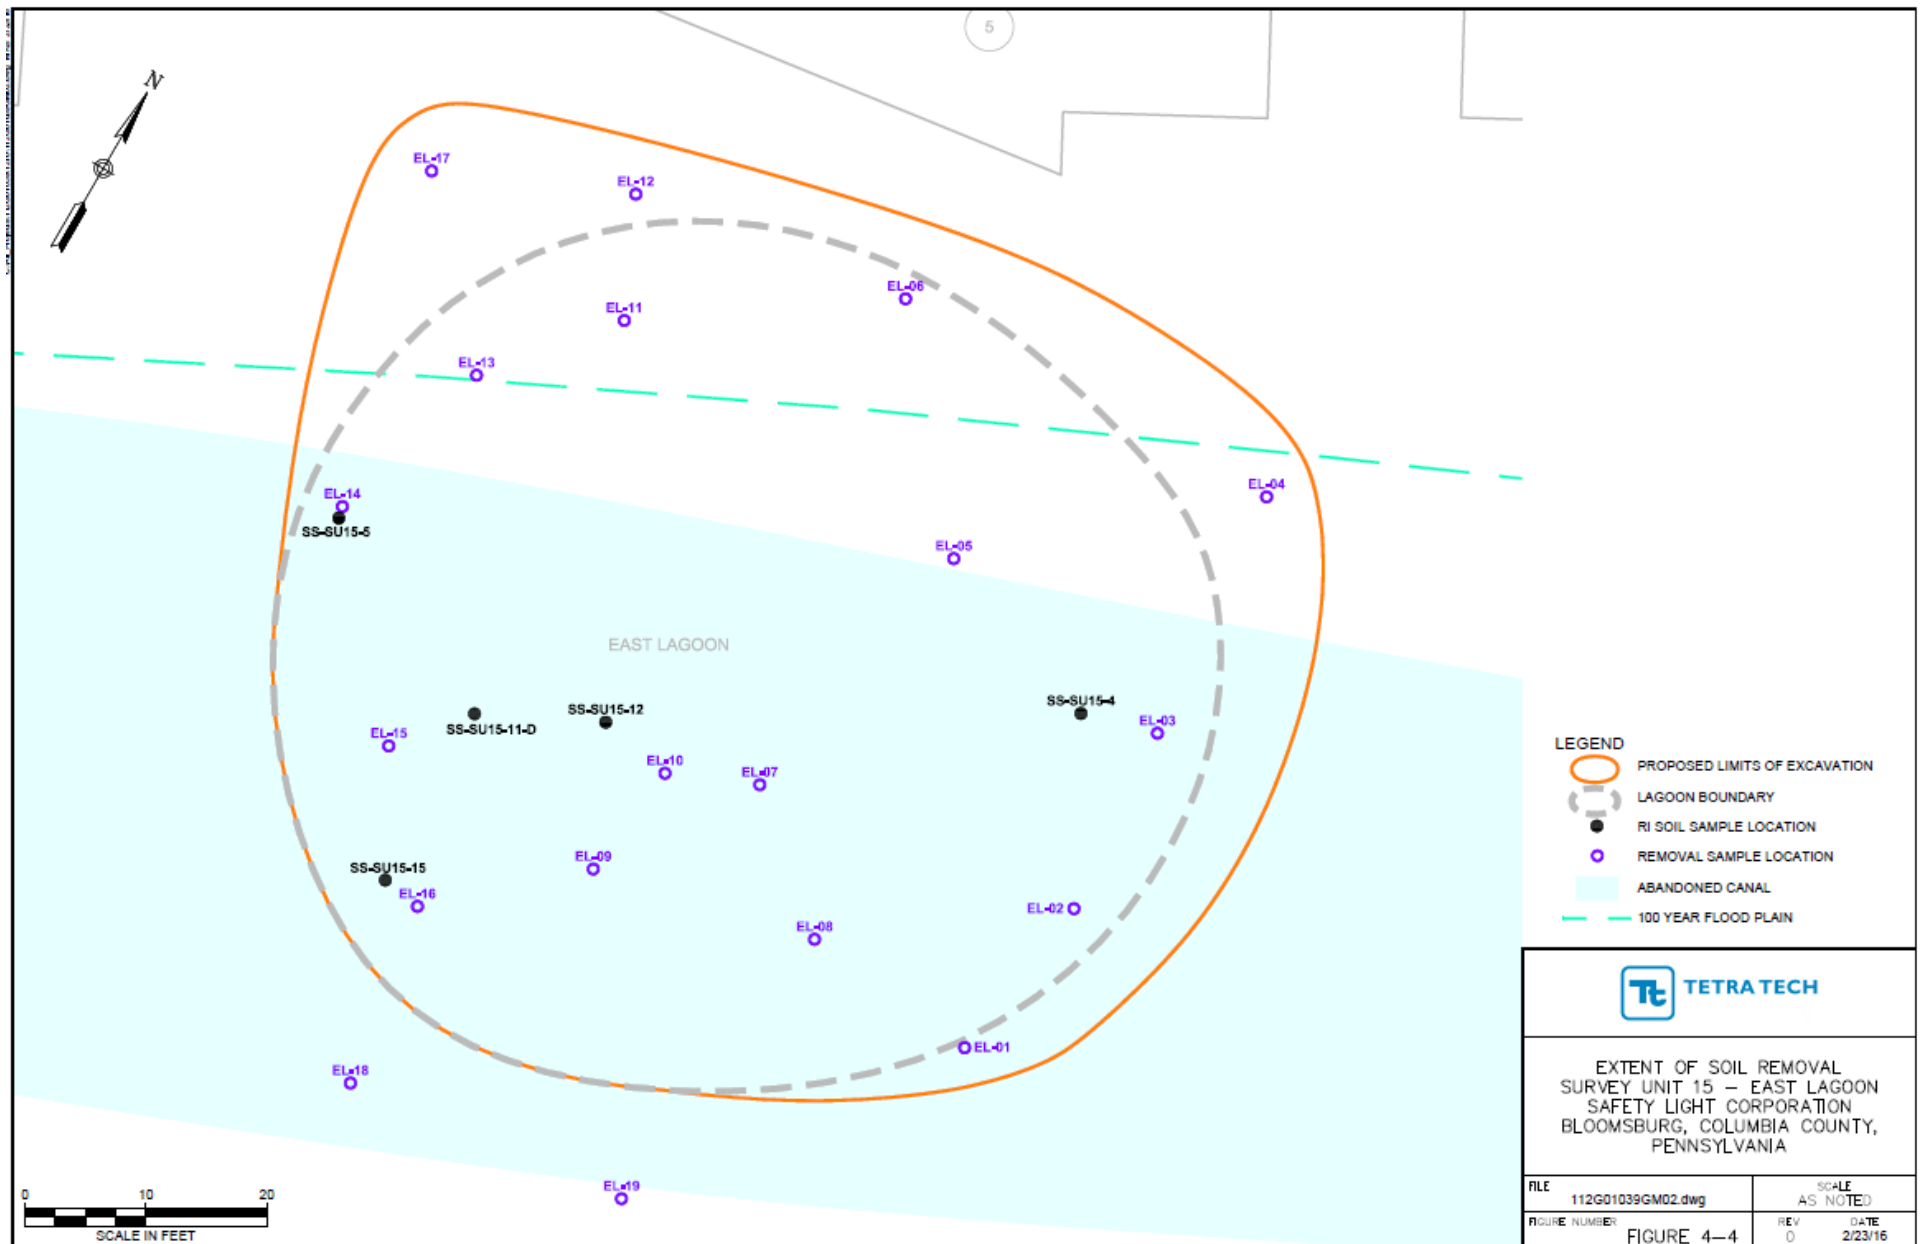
EAST LAGOON SOIL SAMPLE LOCATIONS/APPROXIMATE EXCAVATION LIMITS
